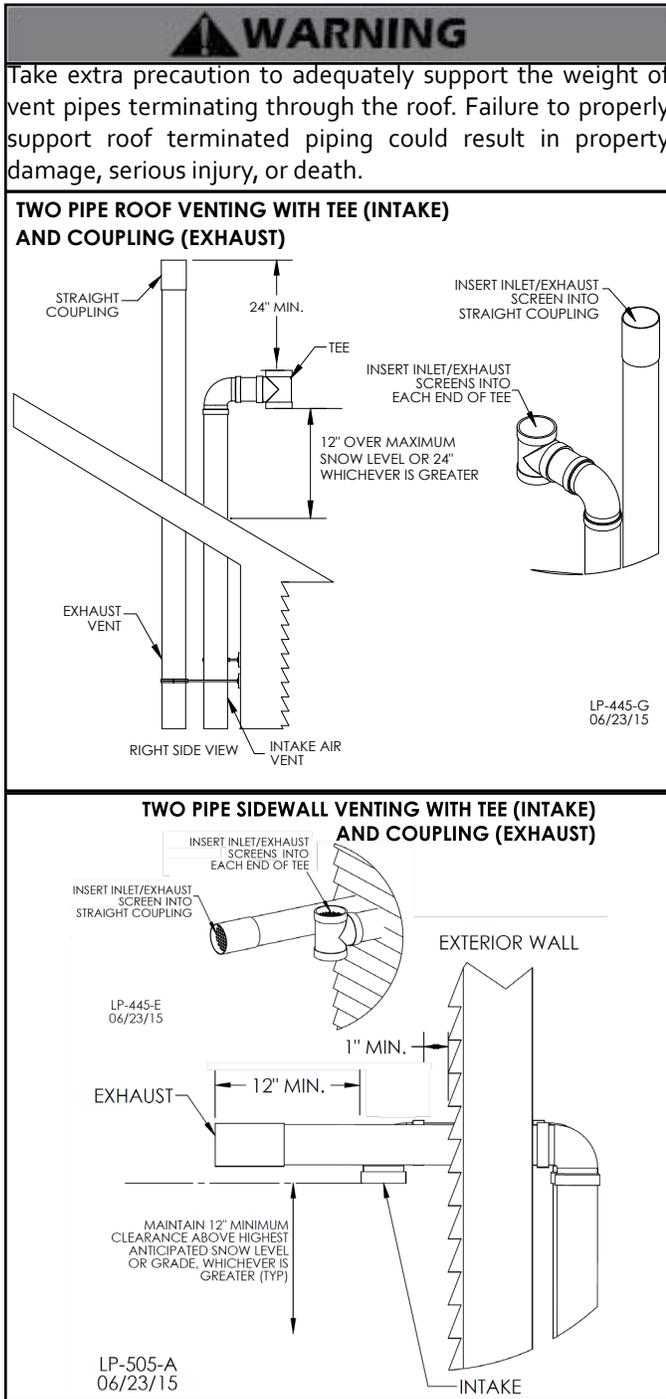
Two Pipe Roof and Sidewall Venting with Included Equipment (Tee and Coupling)
